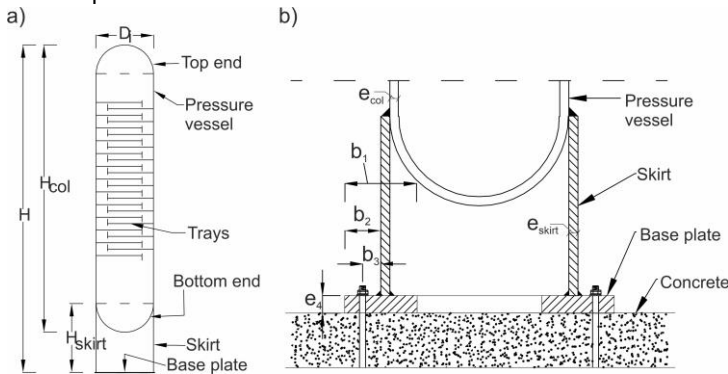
a) Schematic cross-section of a pressure vessel. b) Detailing of the foundation connection.
